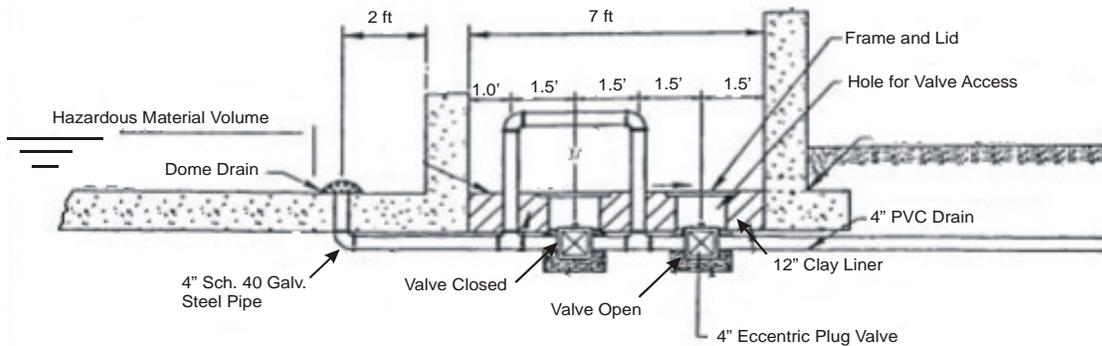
Typical TxDOT Automatic Siphon Detail
